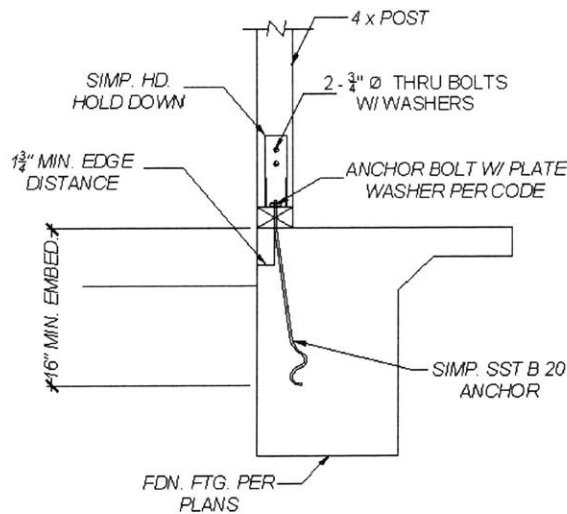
Typical Hold-Down Detail used in Residential Structure (Zone 4)
